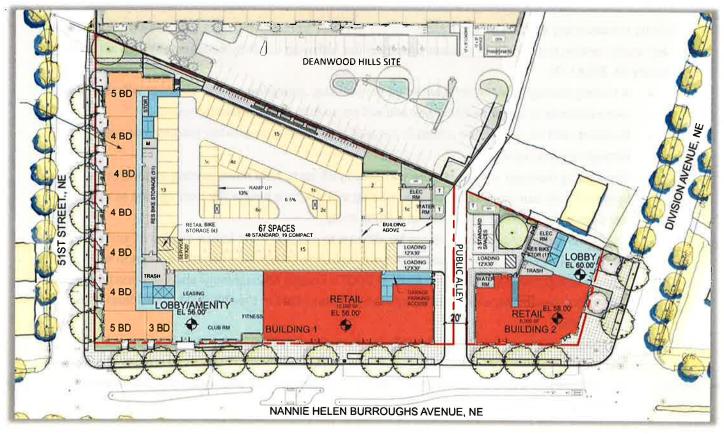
Ground Floor Plan (Source: Applicant Plan Set, Sheet A-01, 12/22/17)
